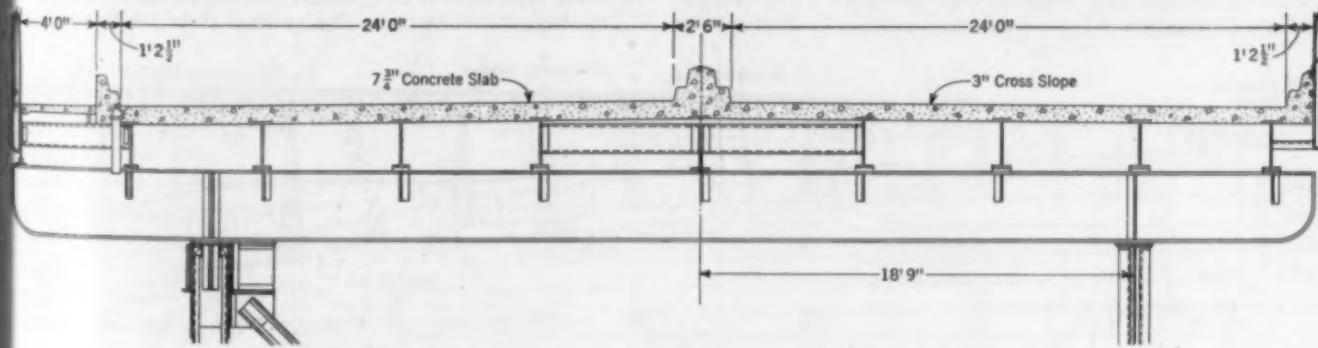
CROSS SECTION OF THAMES RIVER HIGHWAY BRIDGE DECK
